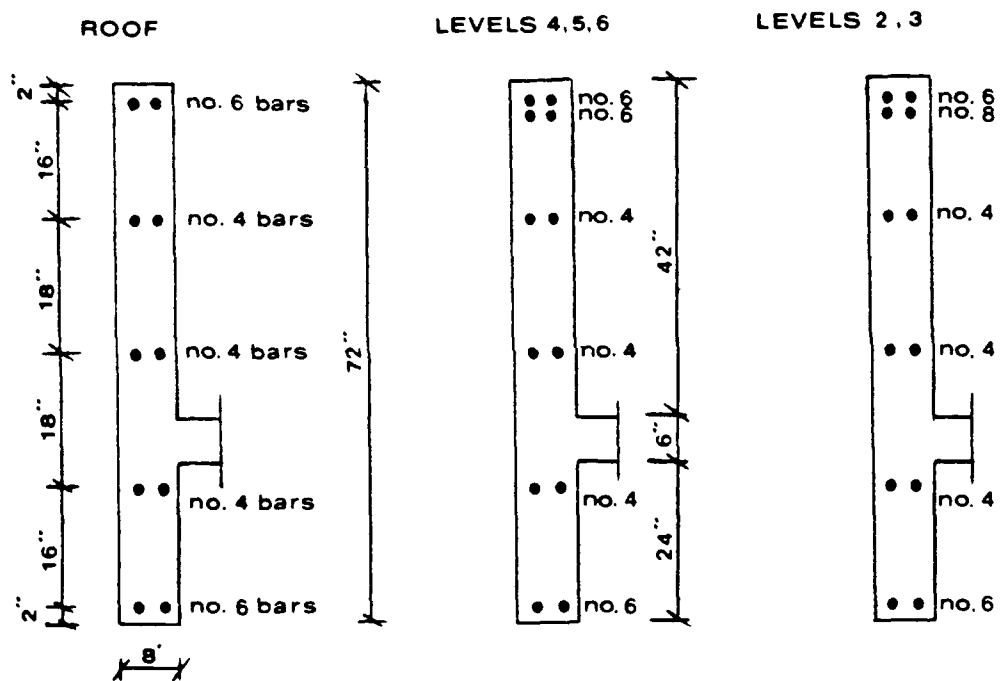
Spandrel reinforcement for the six story prototype frame
